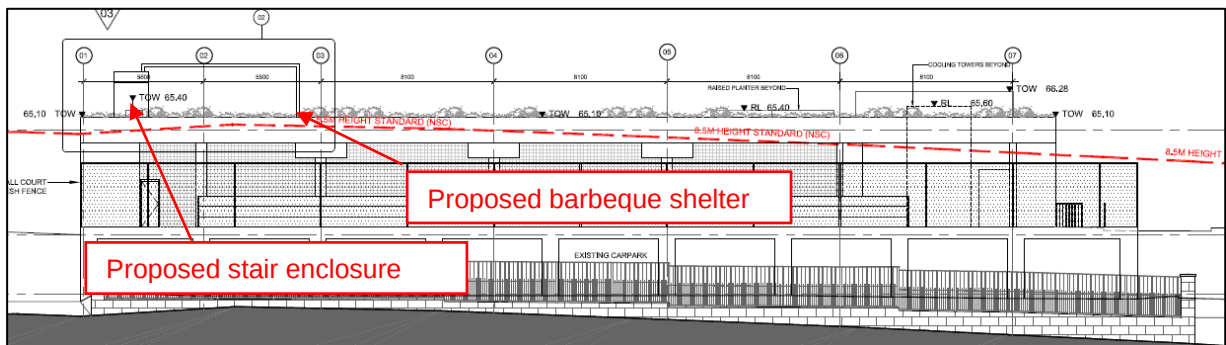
| Proposed west-east section through carpark and roof terrace looking north (Source: Applicant's Modification Application 2019)
